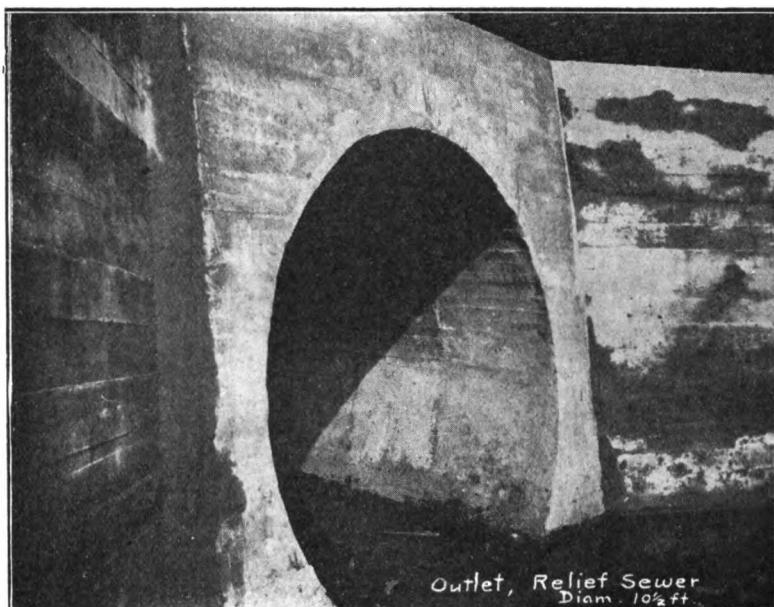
Outlet of the Relief Sewer, Columbus, Ohio.
